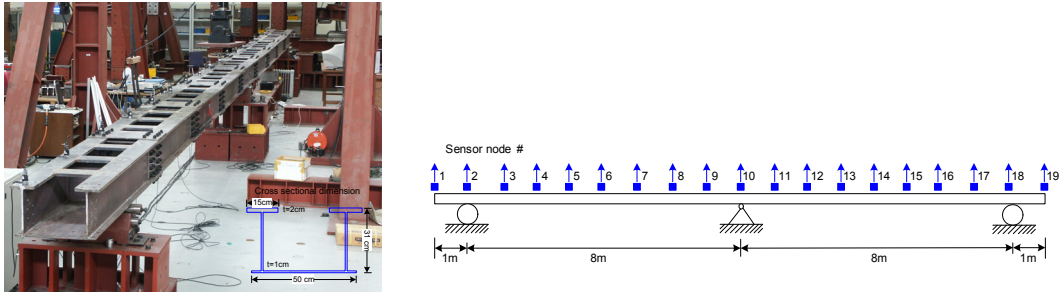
Overview of test set-up on a steel-box girder bridge model (Koo et al. 2008)
